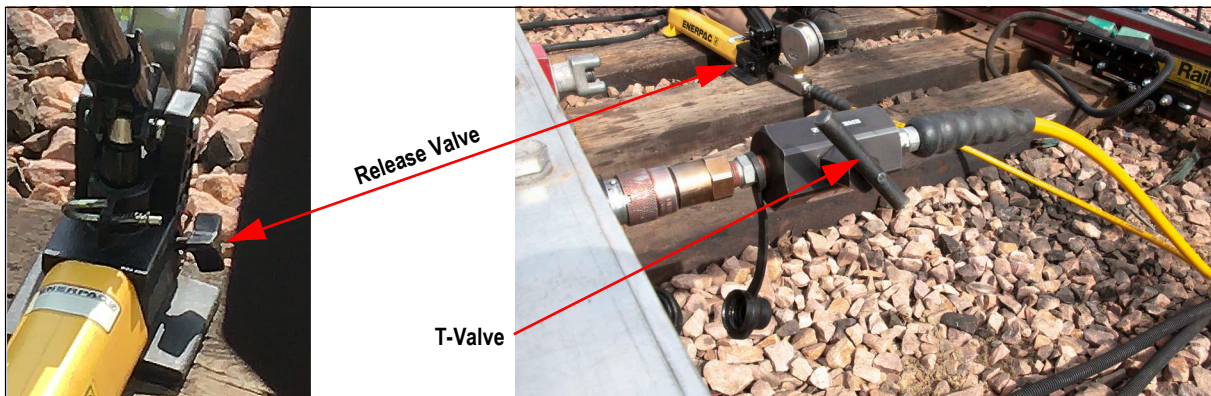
Relief Valve Locations on the Hydraulic Pump and Calibrator
